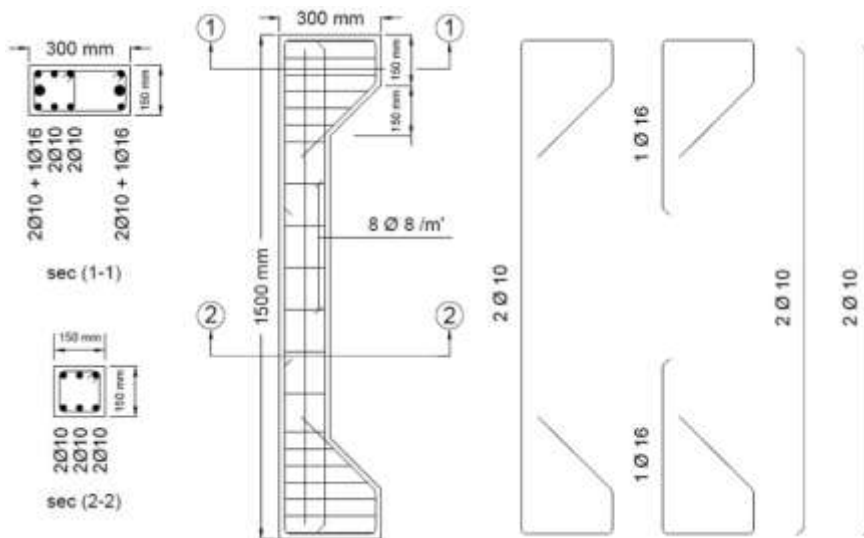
b: Layout of S5 showing the details of dimensions and reinforcement
